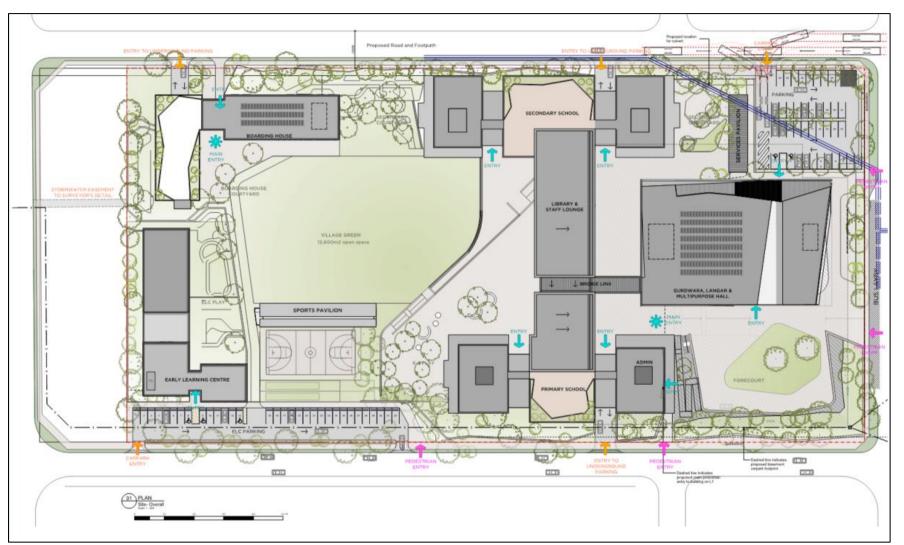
Proposed Site Masterplan for the Proposed Sikh Grammar School (Source: PMDL, 2019)
